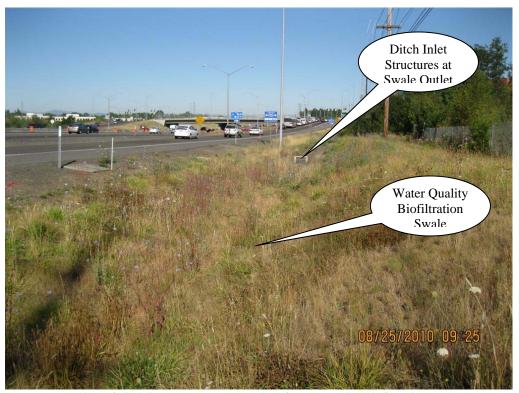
Location of ditch inlet structures at outlet of water quality biofiltration swale (DFI D00111.) Photo taken facing west.
